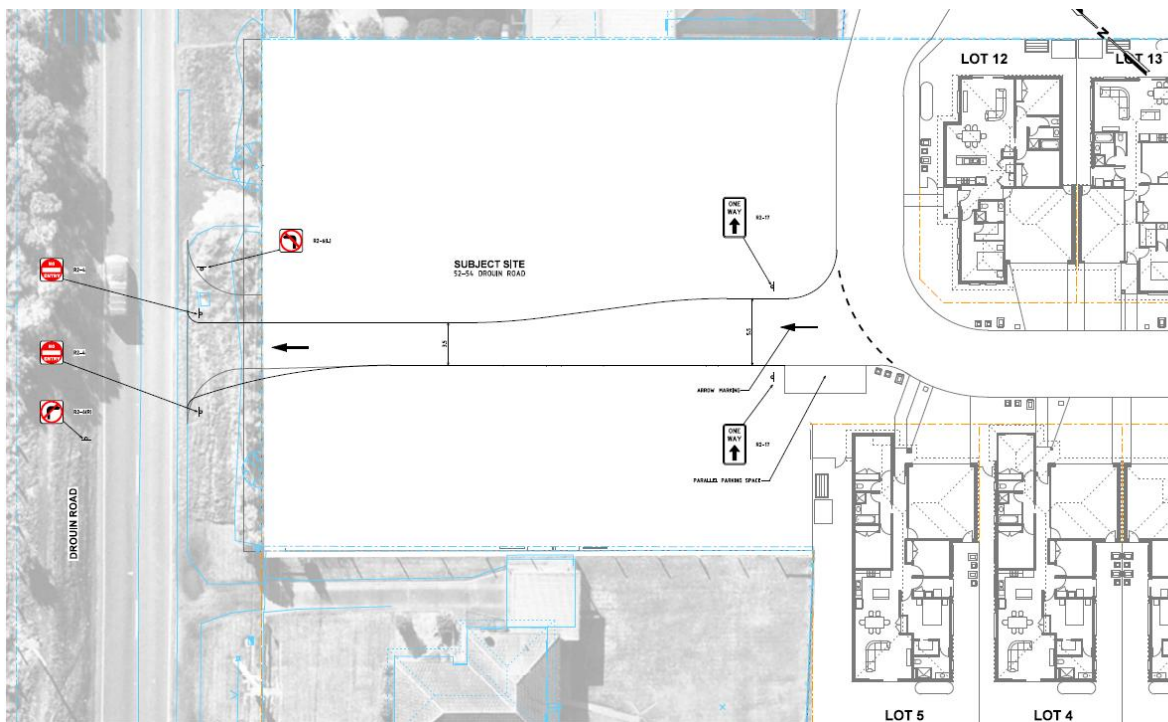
Proposed Concept Plan prepared by Onemilegrid
